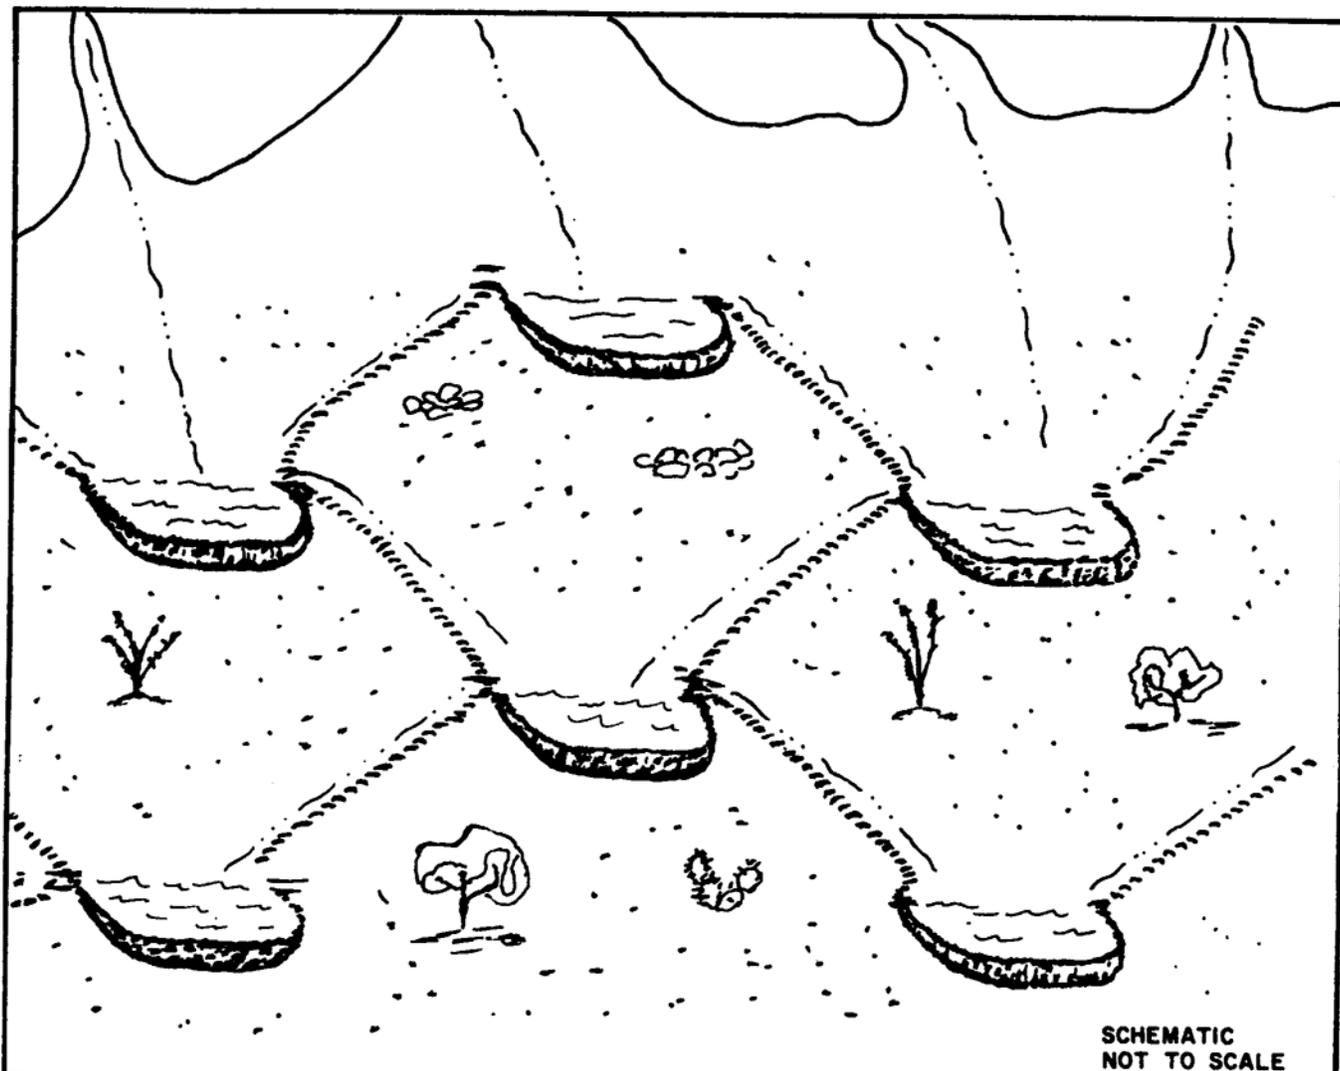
PLAN A: MULTIPOND RECHARGE FACILITY
